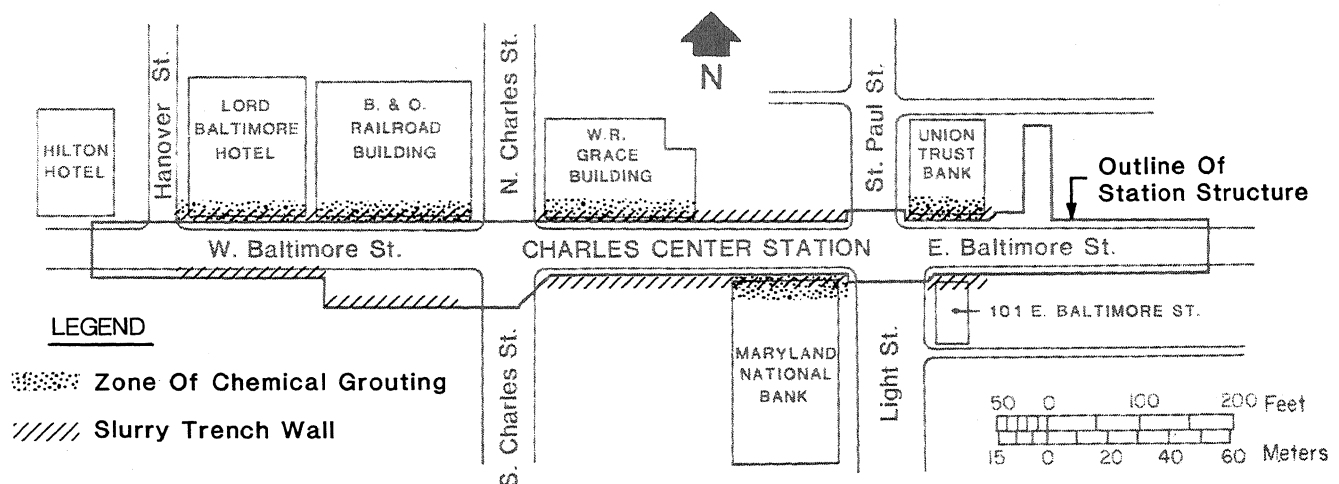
Charles Center Station Site Plan, showing limits of chemical grouting and slurry trench walls.
